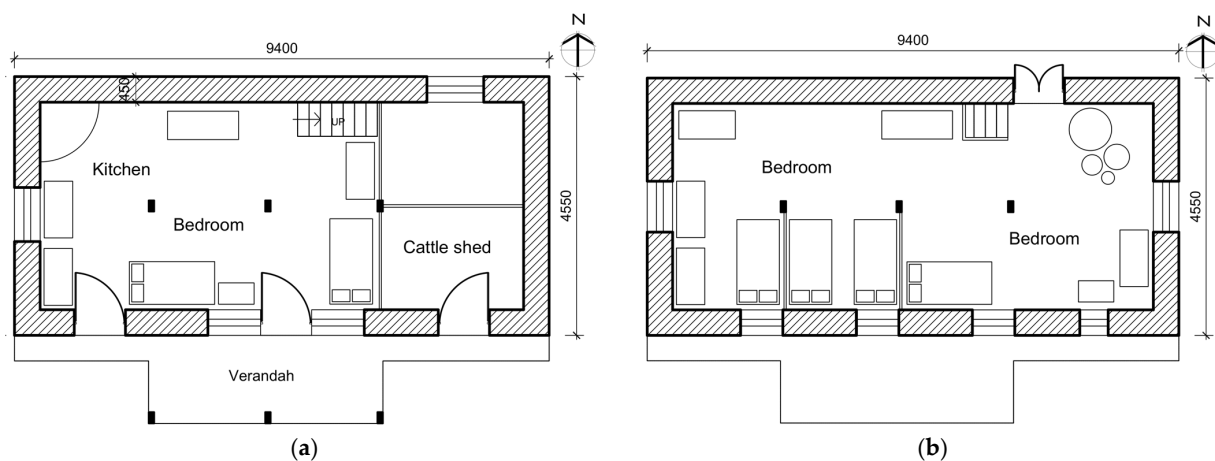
Floor plans of a typical vernacular house: (a) ground-floor plan; (b) first-floor plan.
